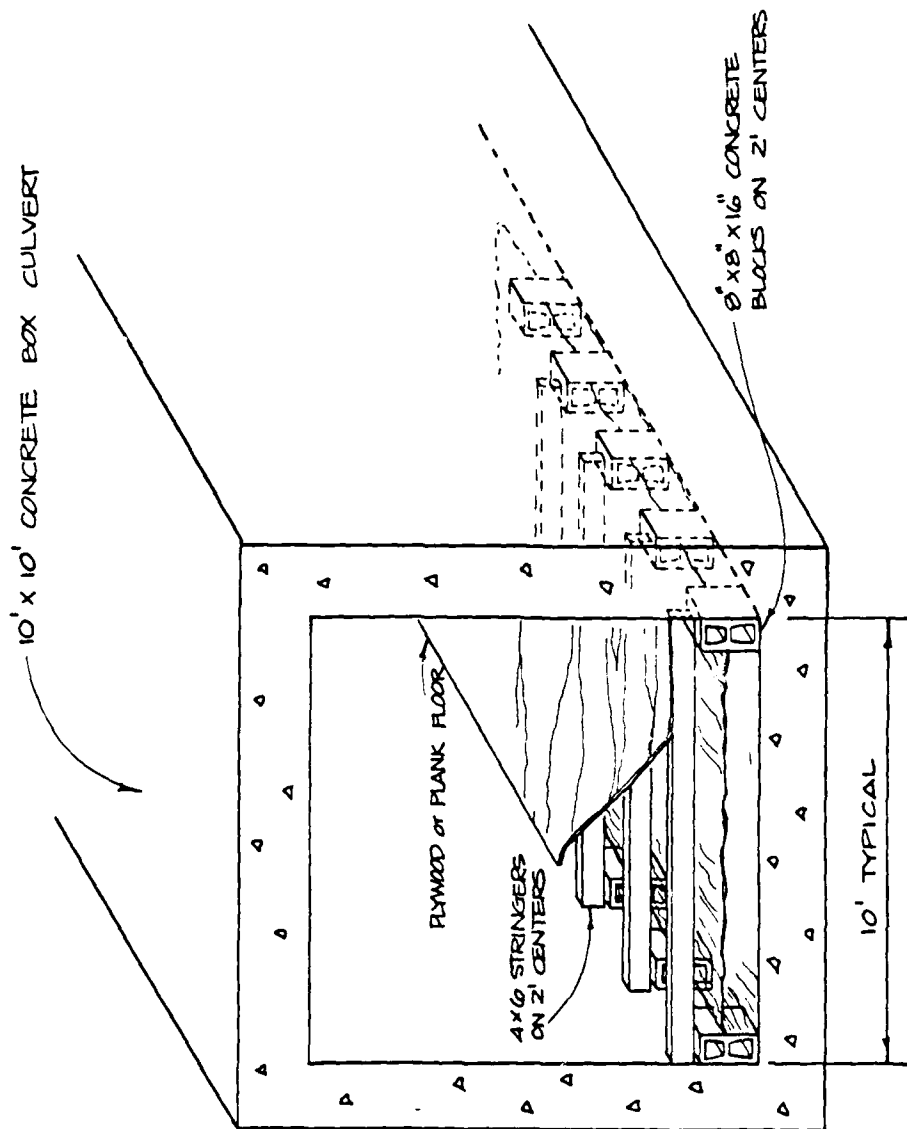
Box Culvert Host Area Shelter With Low-Flow False Floor.
